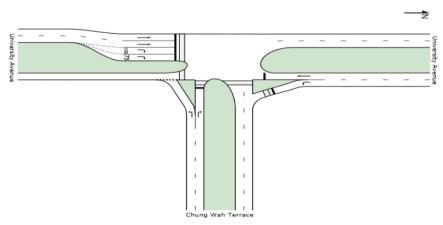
Sidra Model Layout University Ave / Chung Wah Terrace Intersection
